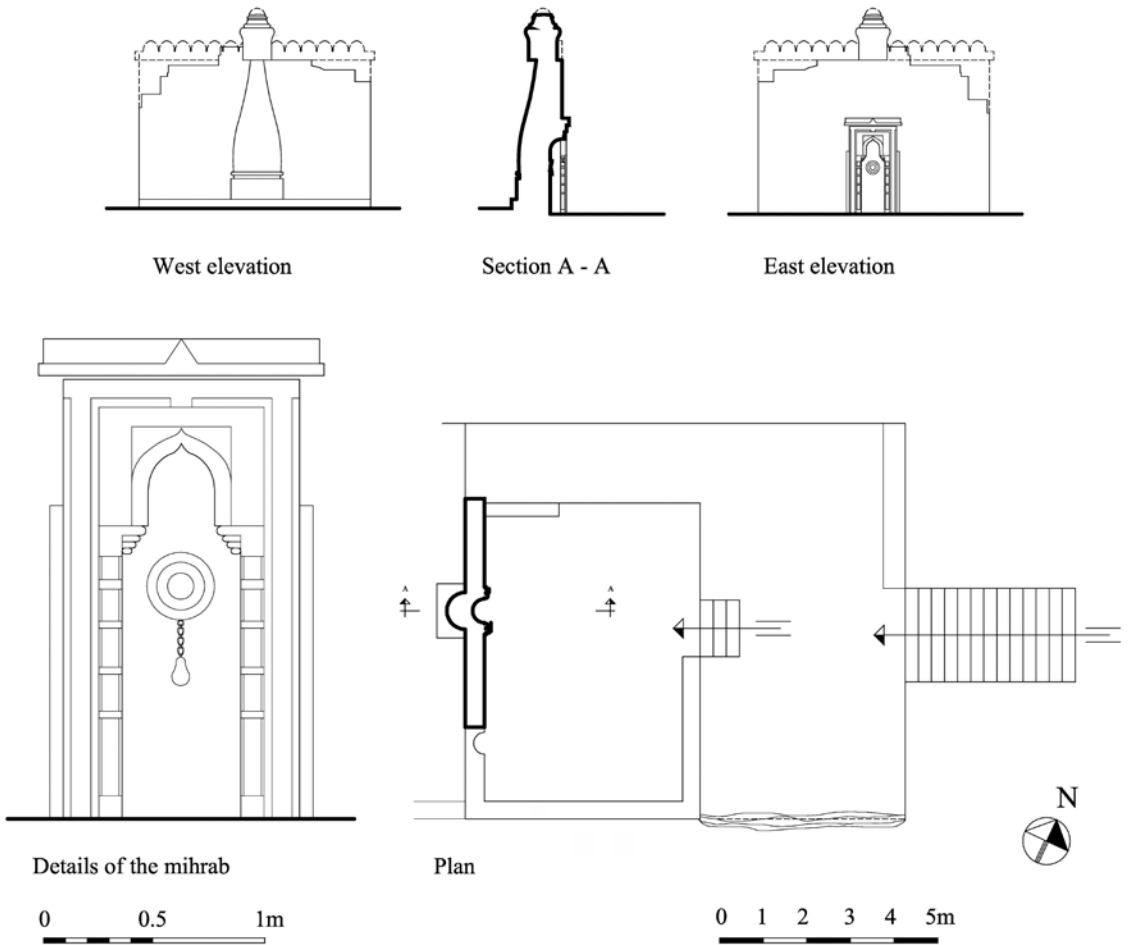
Prayer wall to the east of the Qāḍī Muḥammad shrine, plan, elevations and section through the *mihrāb*, and a detailed elevation of the *mihrāb*.
